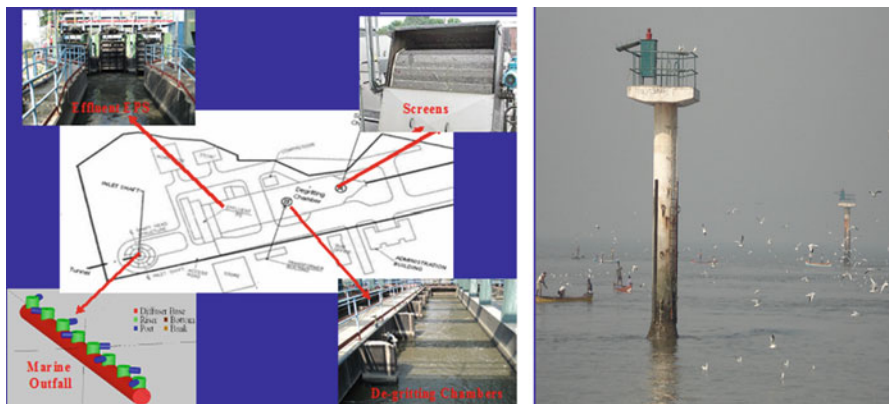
Layout of preliminary wastewater treatment facility and poles of marine outfall, Mumbai
